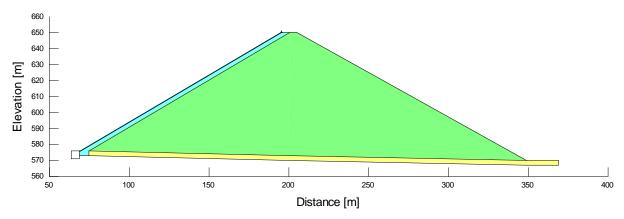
Rechani dam, Kochani, GFRD, Hs = 81 m, (1) foundation: deposit in the river bed, (2) filter: sub-layer of the upstream facing of geomembrane, (3) shell: rock-fill
